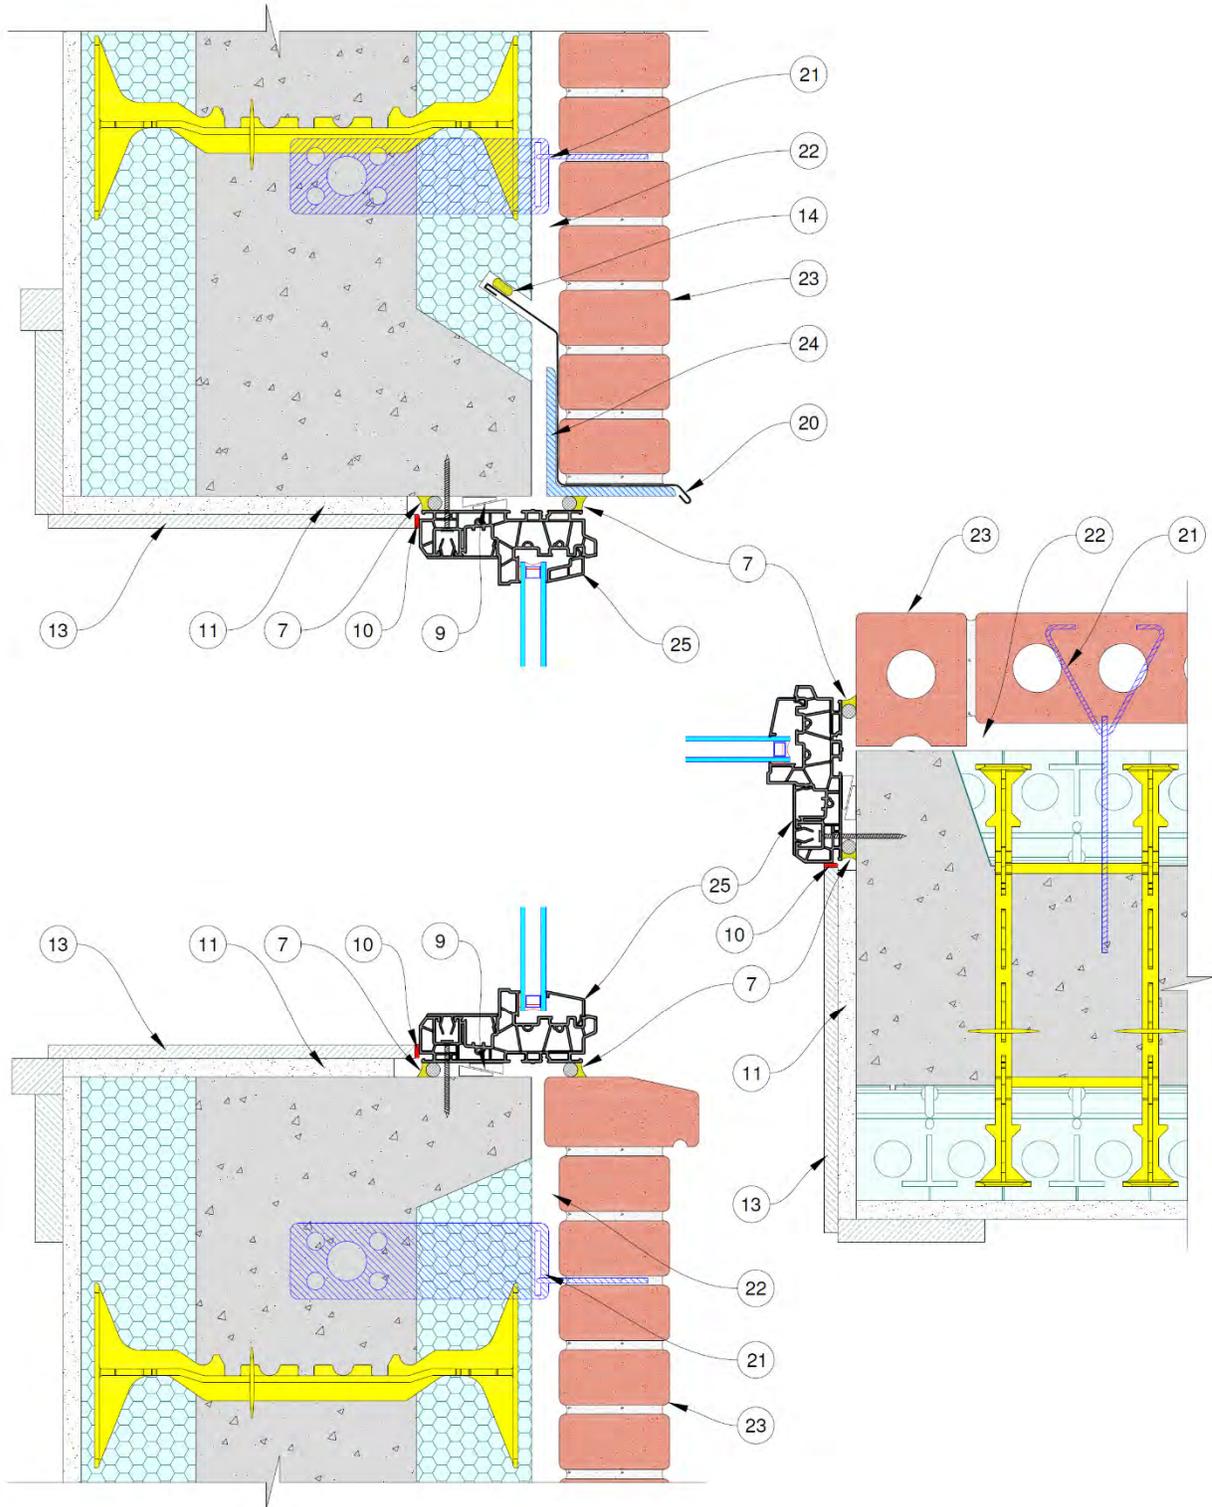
ICF Window Assembly - Direct to concrete, Boxed window flush, Brick veneer
